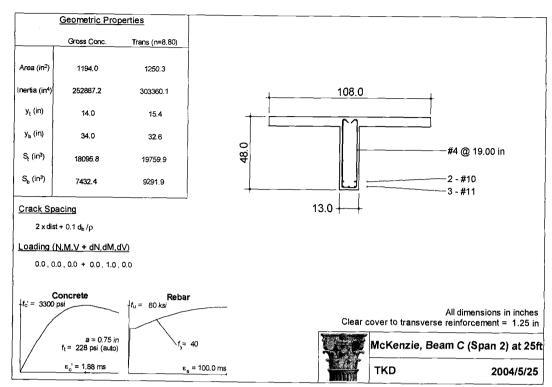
McKenzie R. Bridge; Span 2 at 25 ft. (RESPONSE 2000TM)
